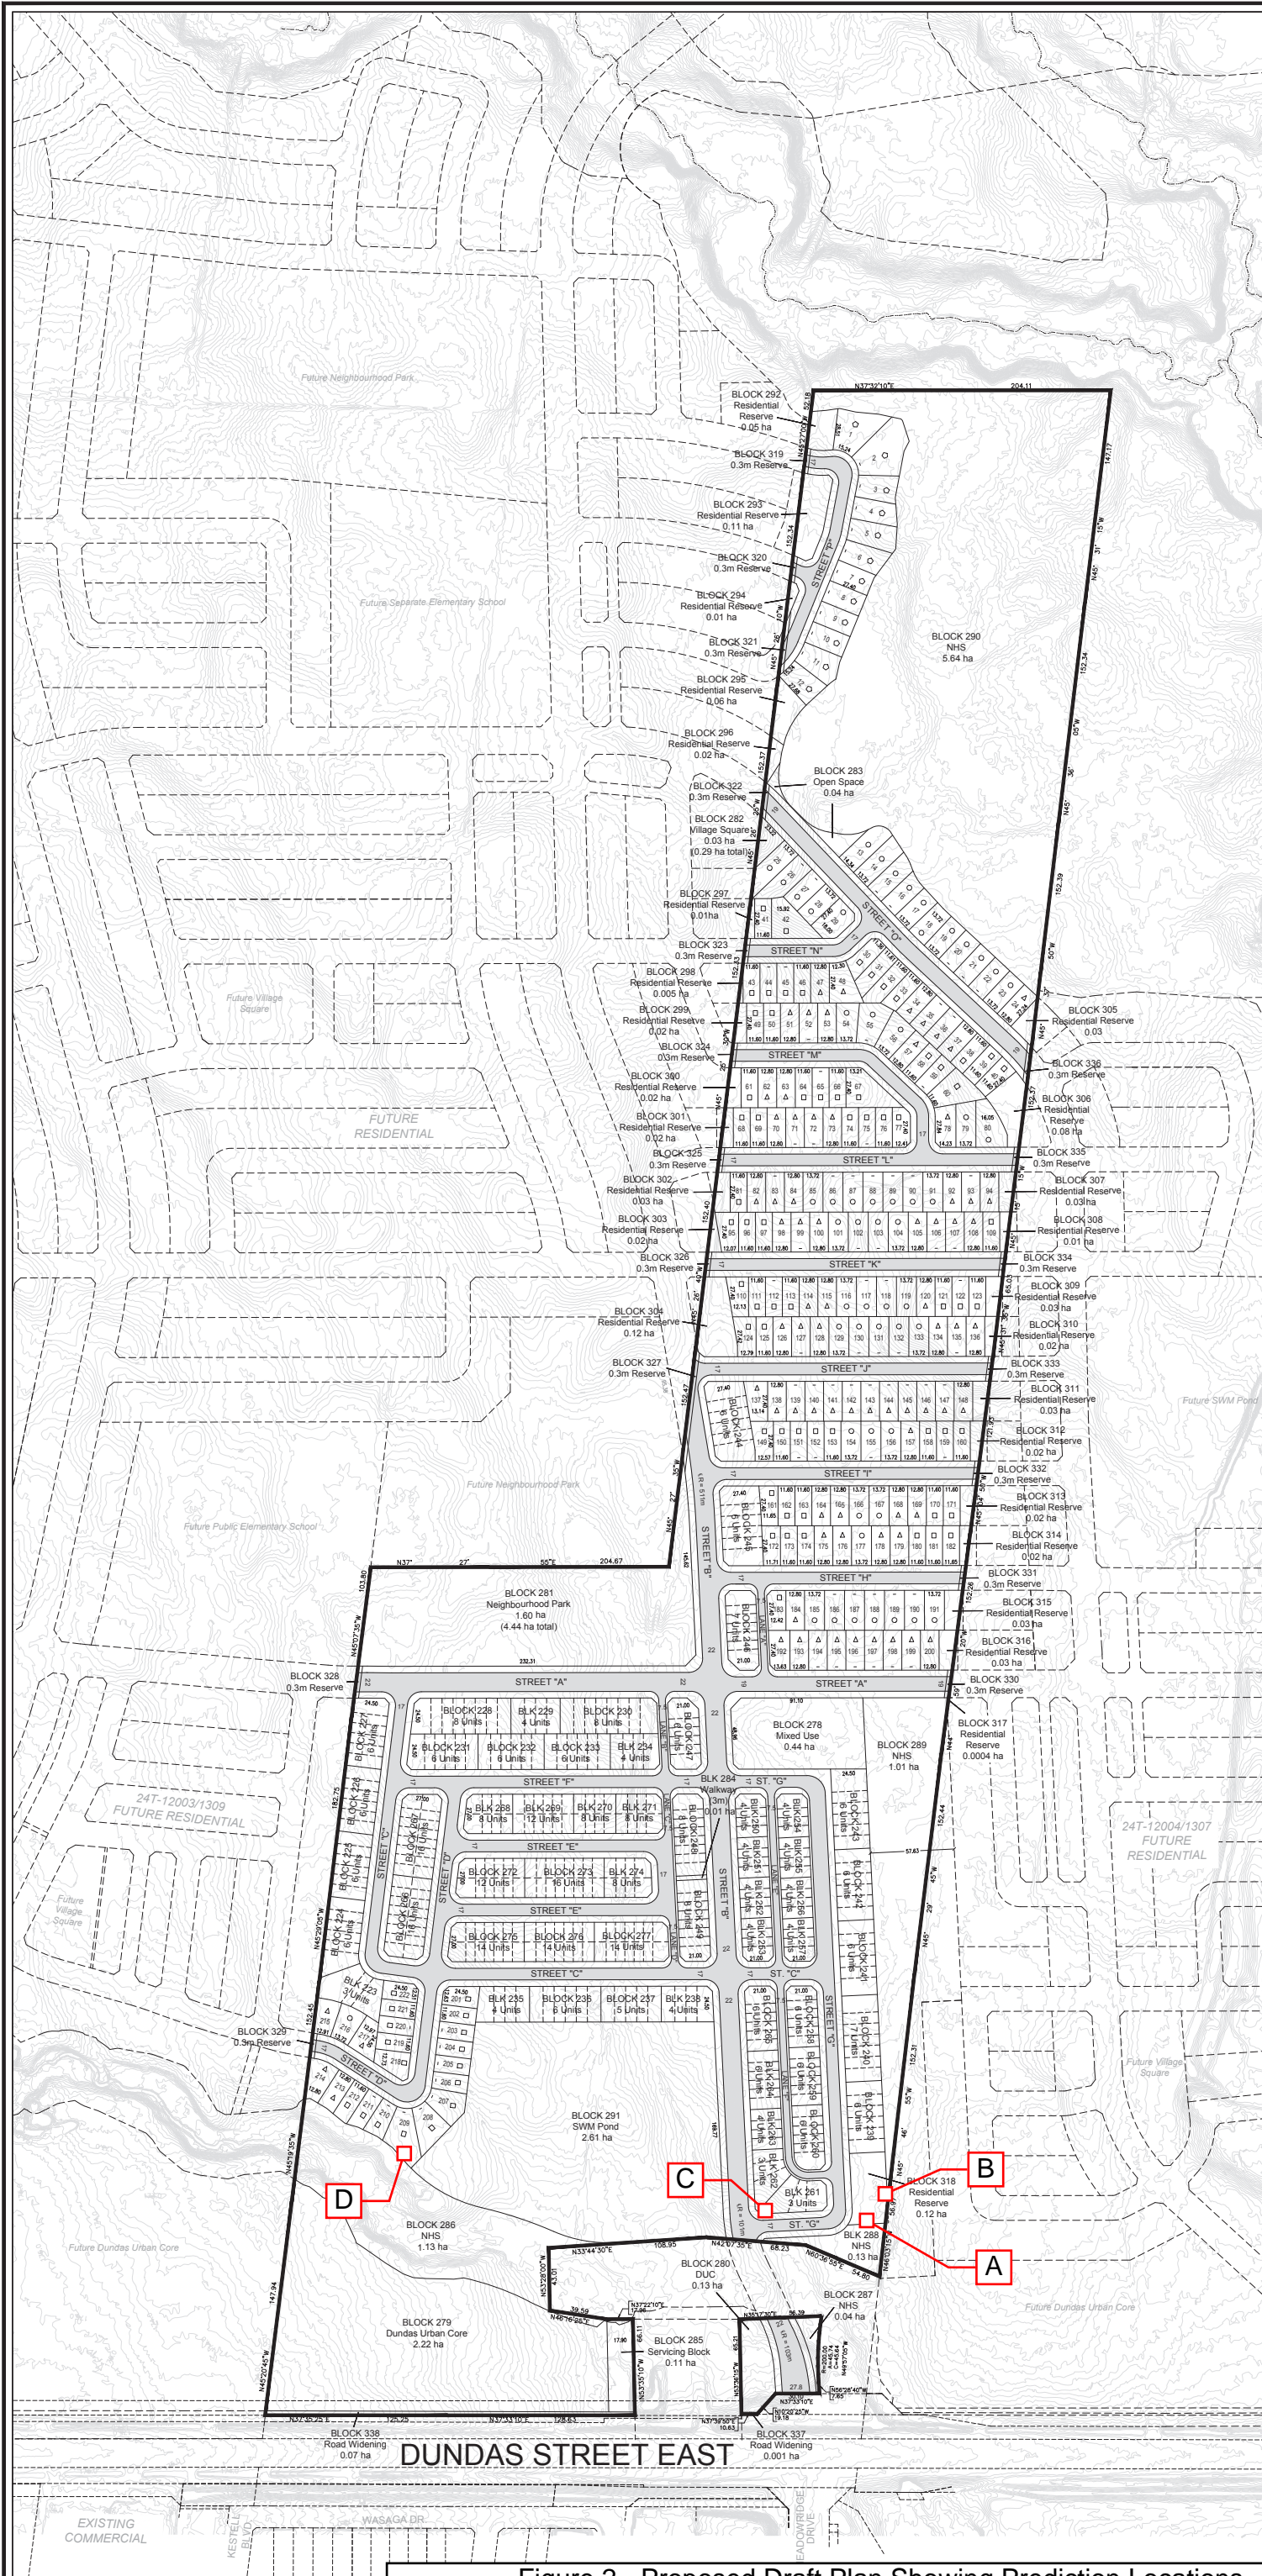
Proposed Draft Plan Showing Prediction Locations
